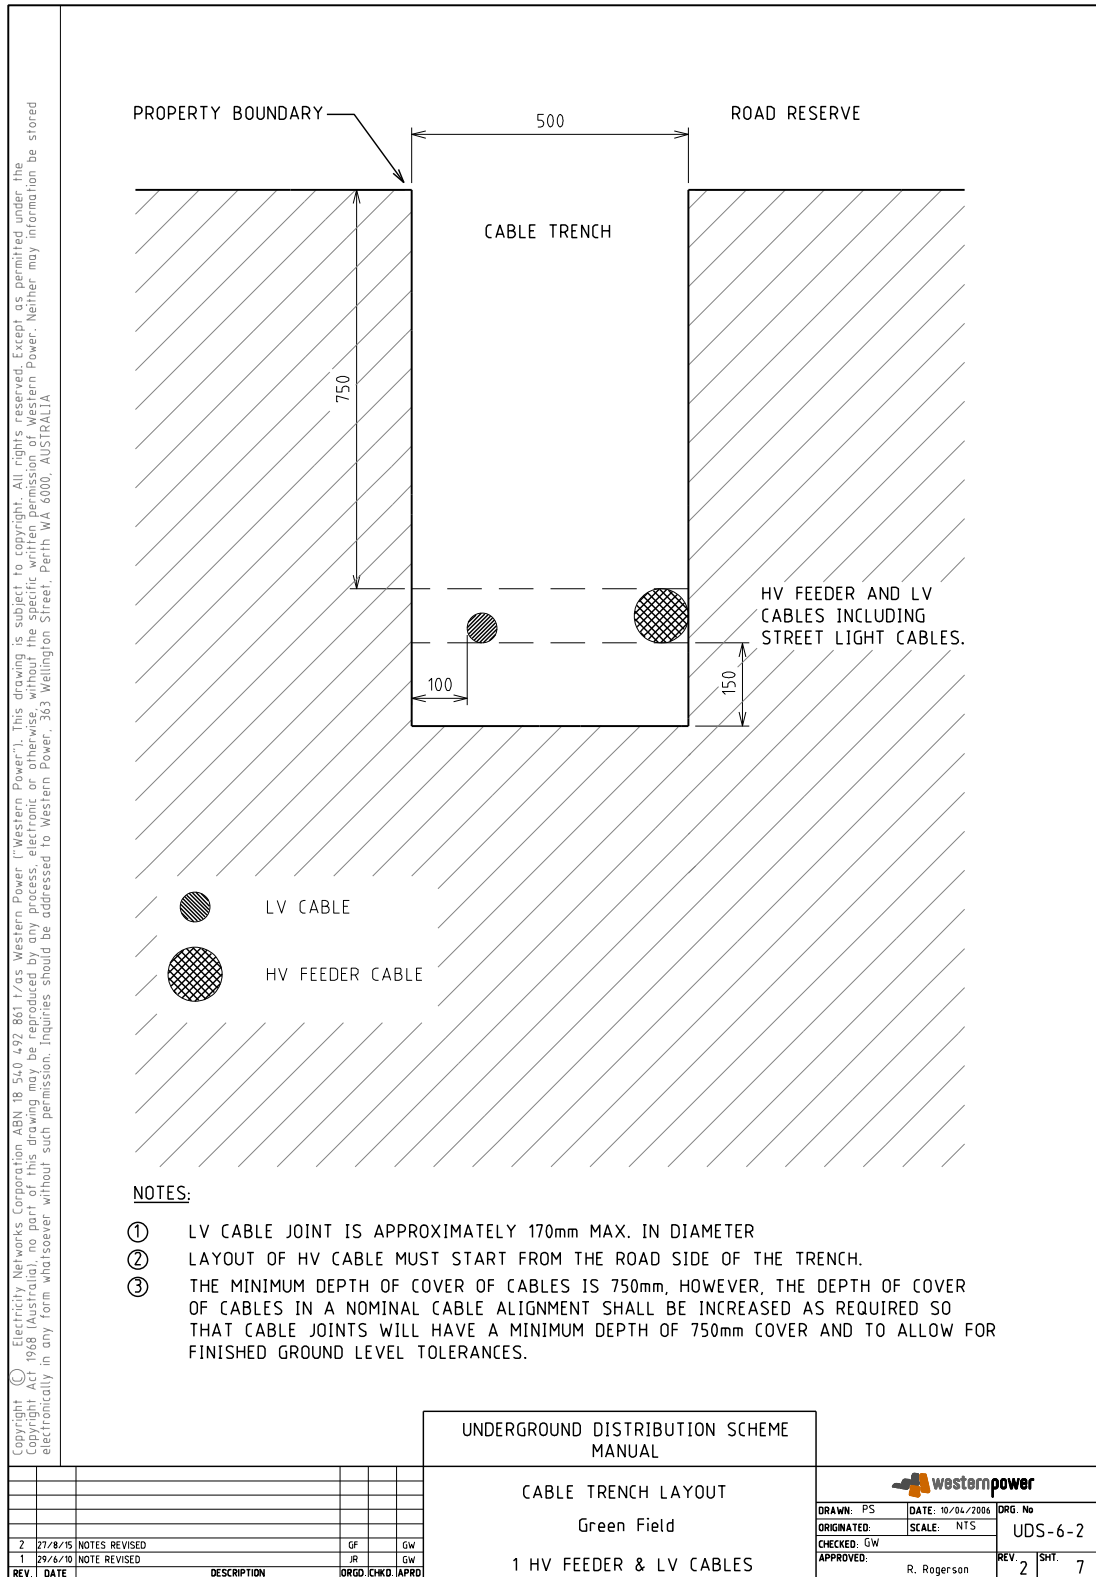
Cable Trench Layout (Sheet 7 of 7)
